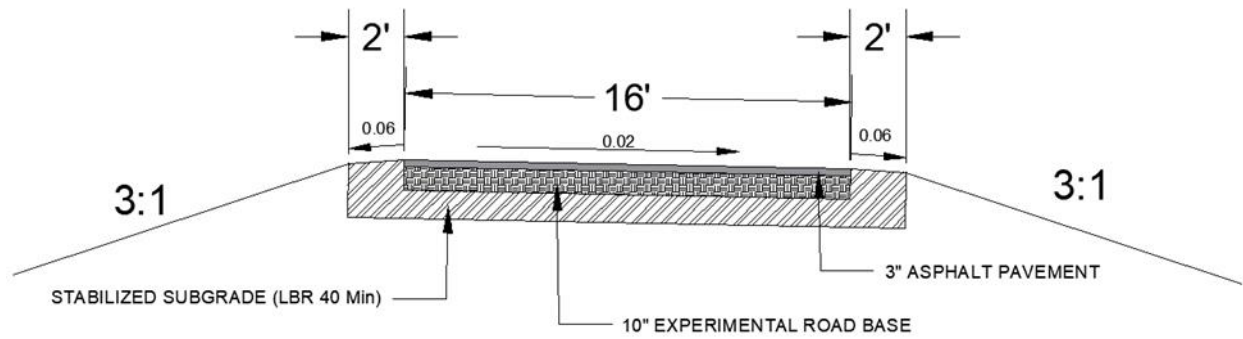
Cross section of the pilot project roadway including 3-inch asphalt layer, 10-inch test or control base section, stabilized subgrade and shoulder.
